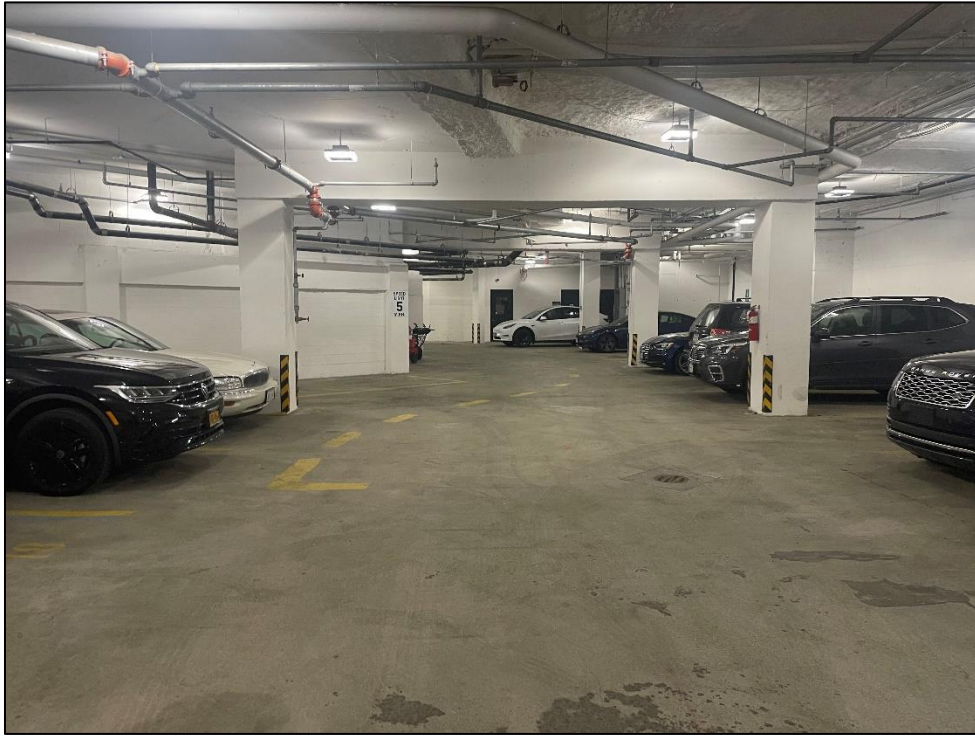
, 05/17/2023: View of concrete building slab composite cover in ventilated parking garage (facing east).
